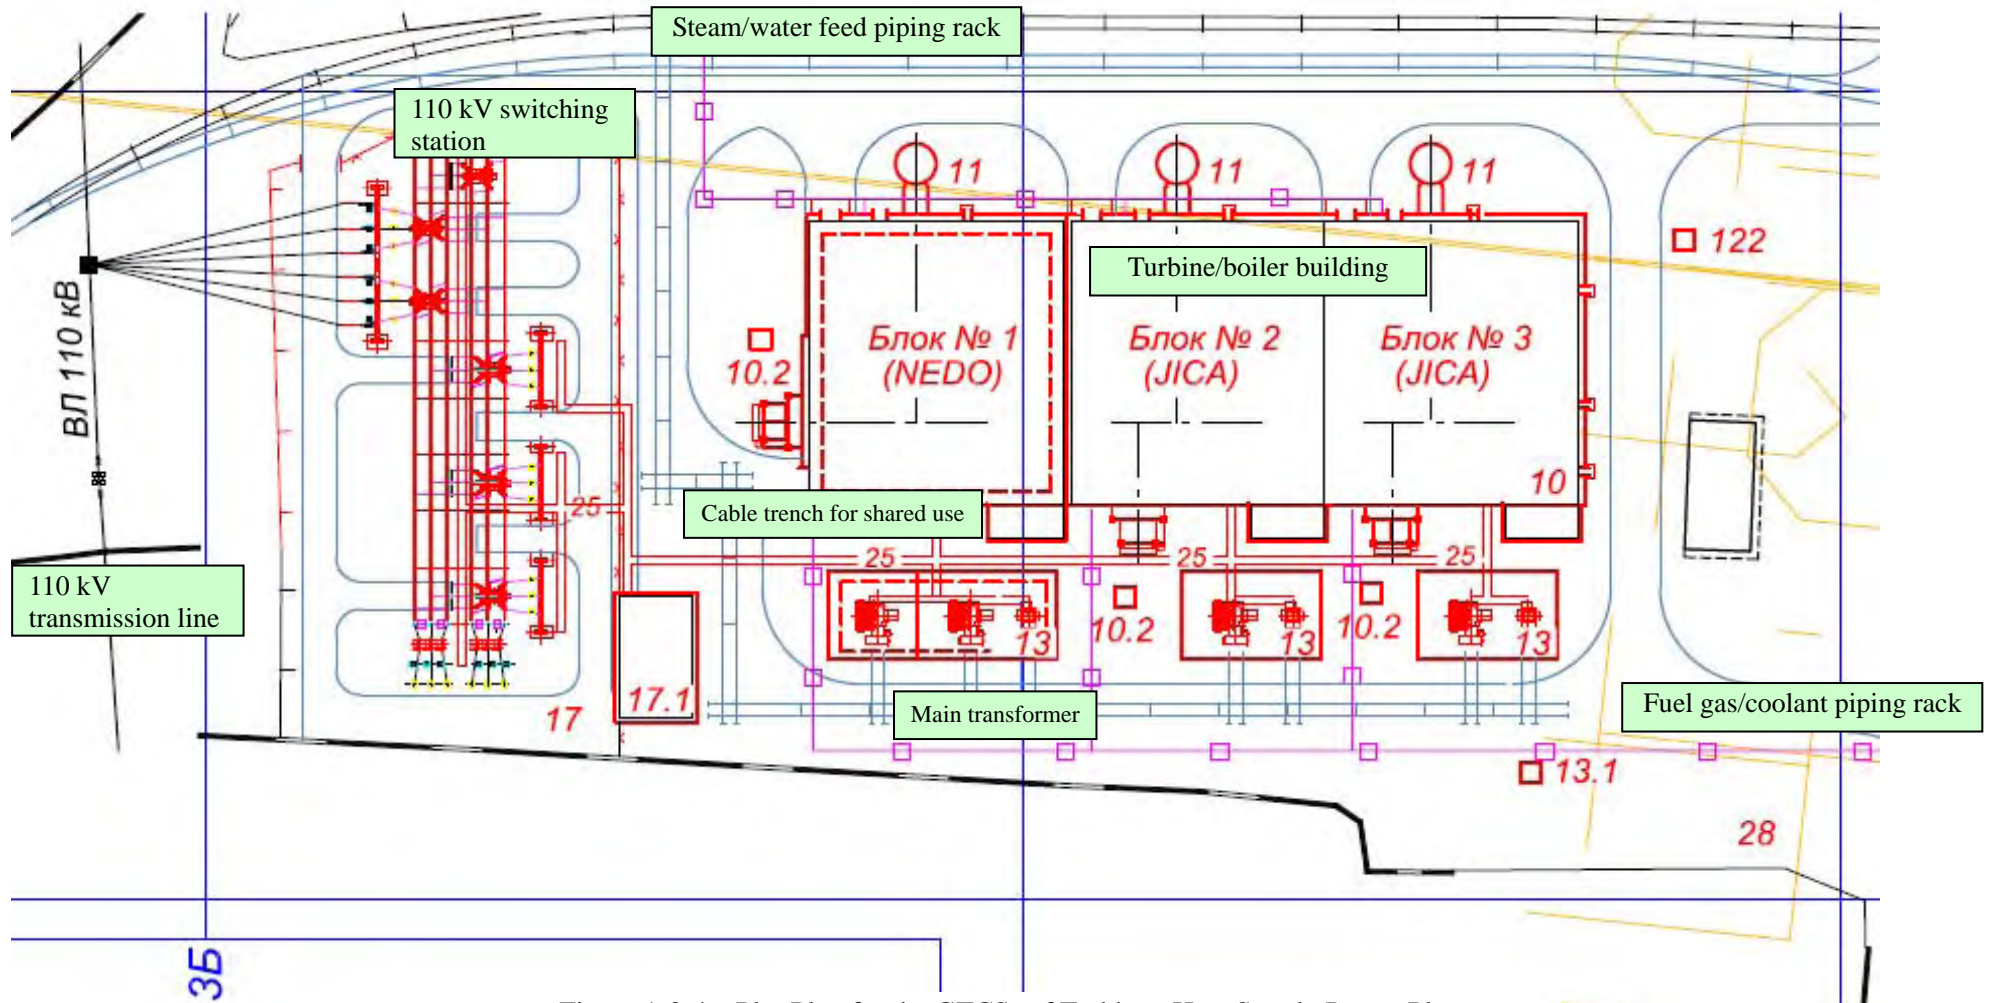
Plot Plan for the GTCSs of Tashkent Heat Supply Power Plant
